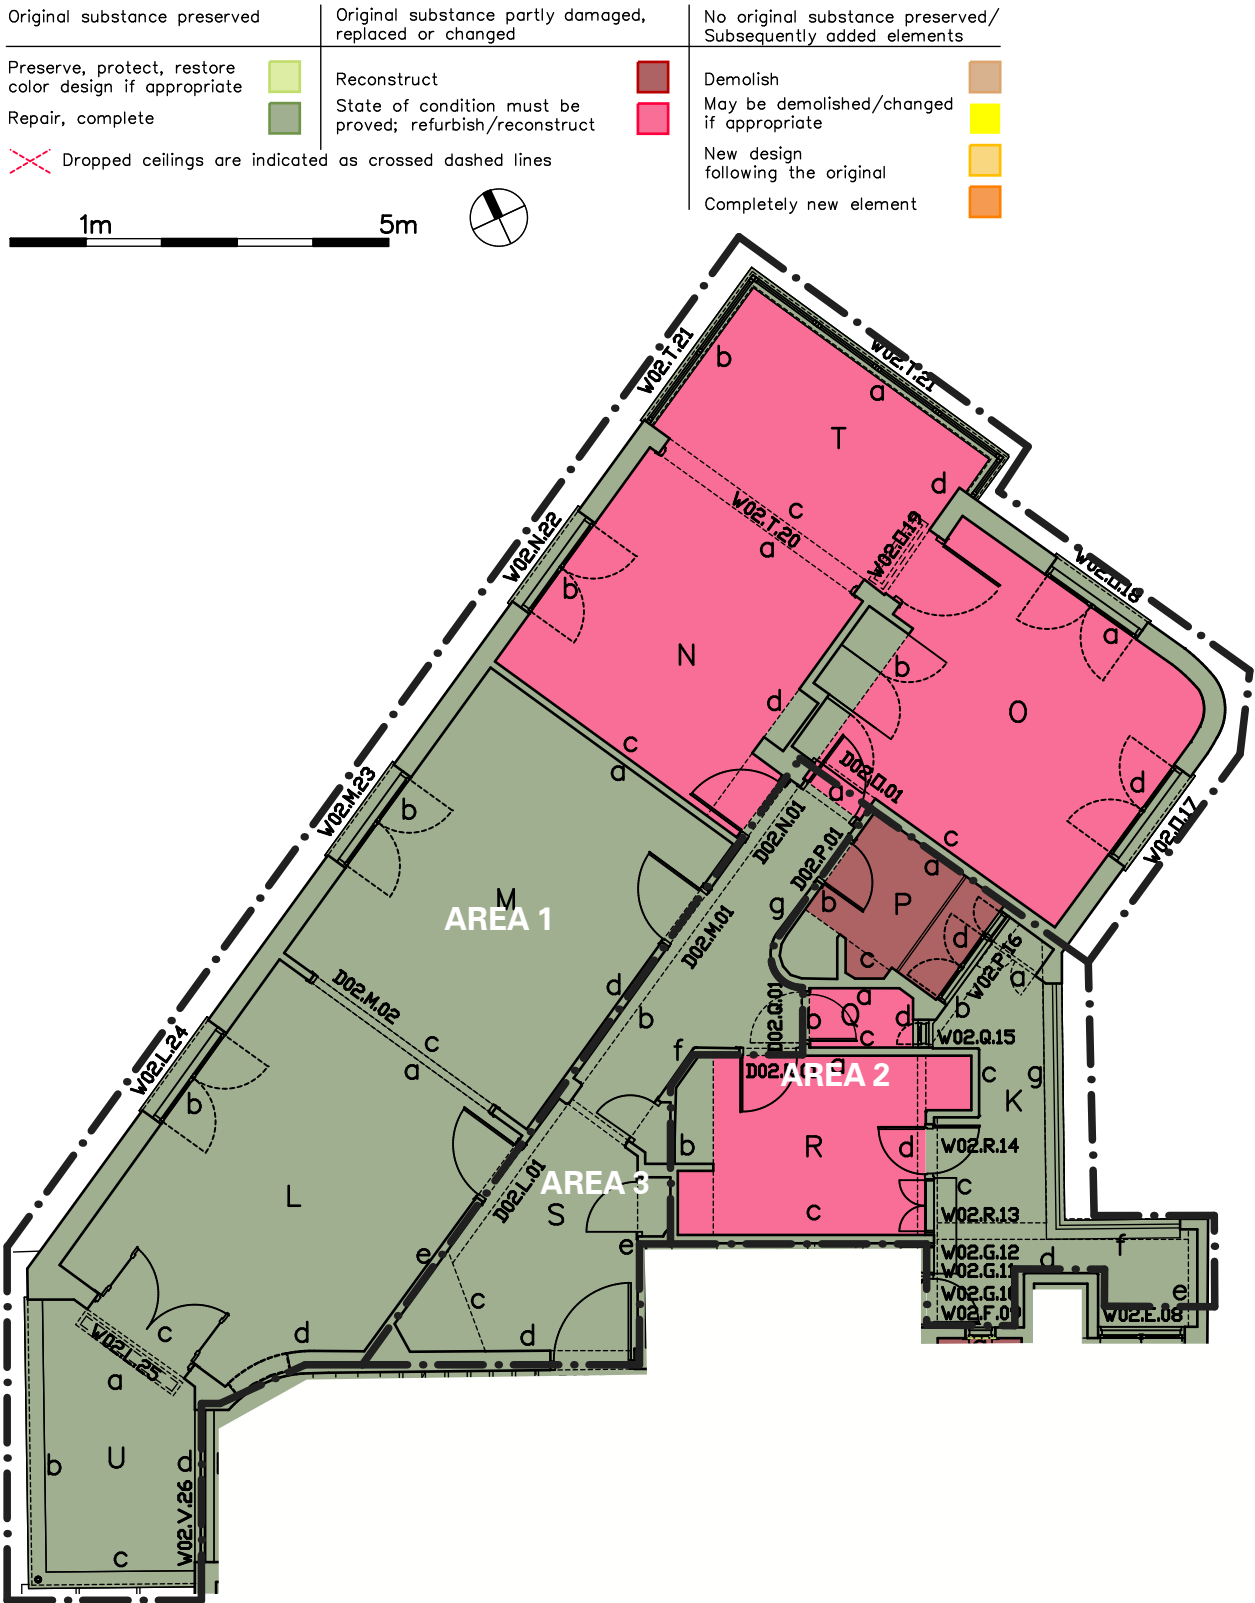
3rd floor, apartment 2, preservation measures, walls and floors
